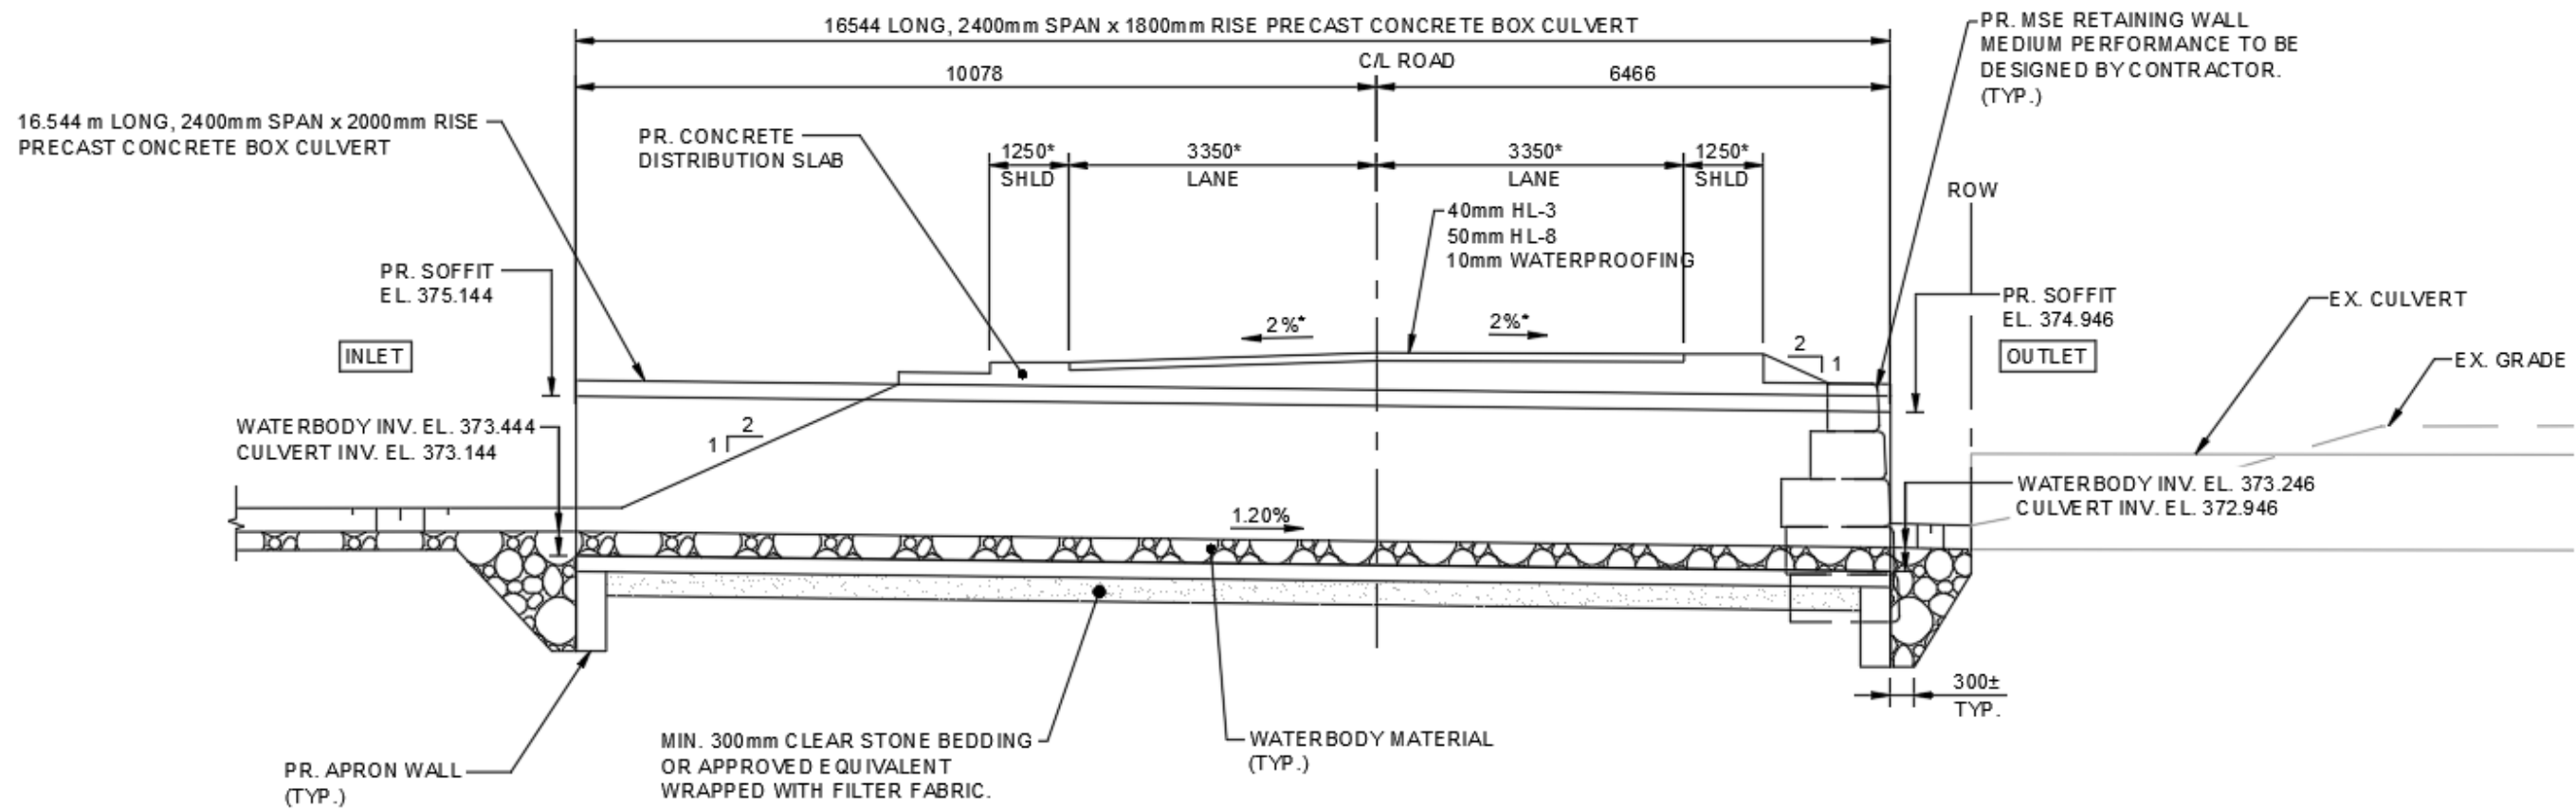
Elevation View of Conceptual Design, Bridge 33-P
